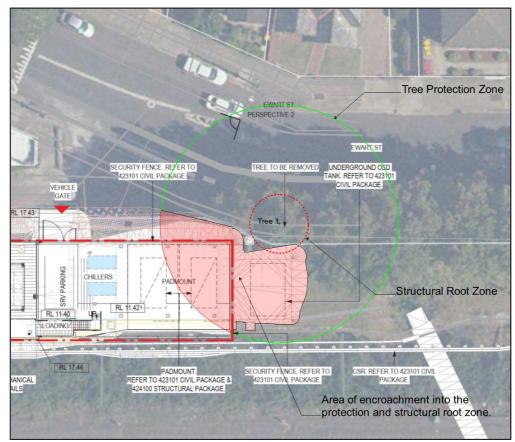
Extract from Overall Arrangement Site Plan – Service Building showing the encroachment into the TPZ and SRZ of tree 1.
